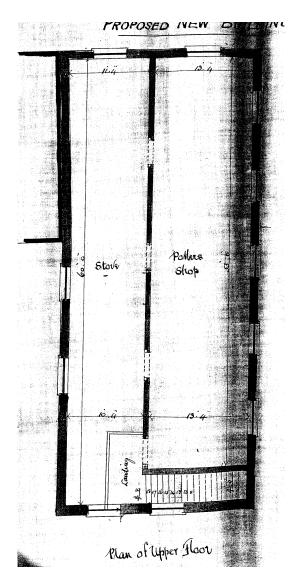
First floor plan of the Potters' Shop as adopted. Prince's Drive lies to the right.23
